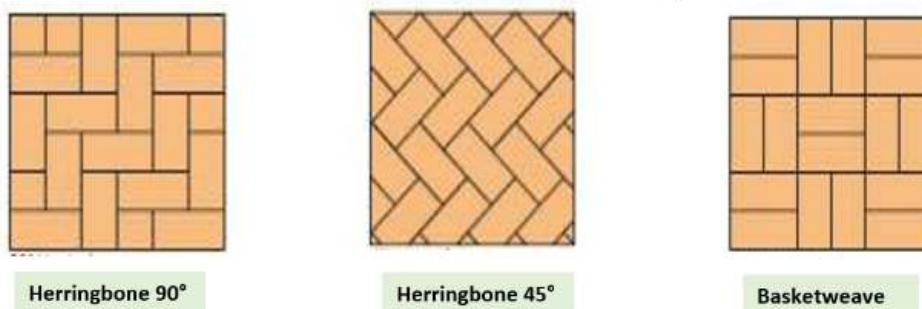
Horizontal and Vertical Pavement Pattern Model Installation
